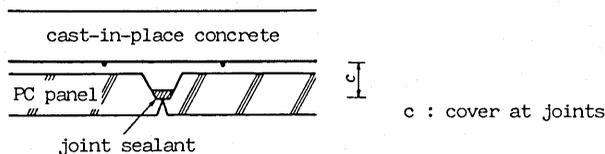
Concrete cover at joints of prestressed concrete panels
